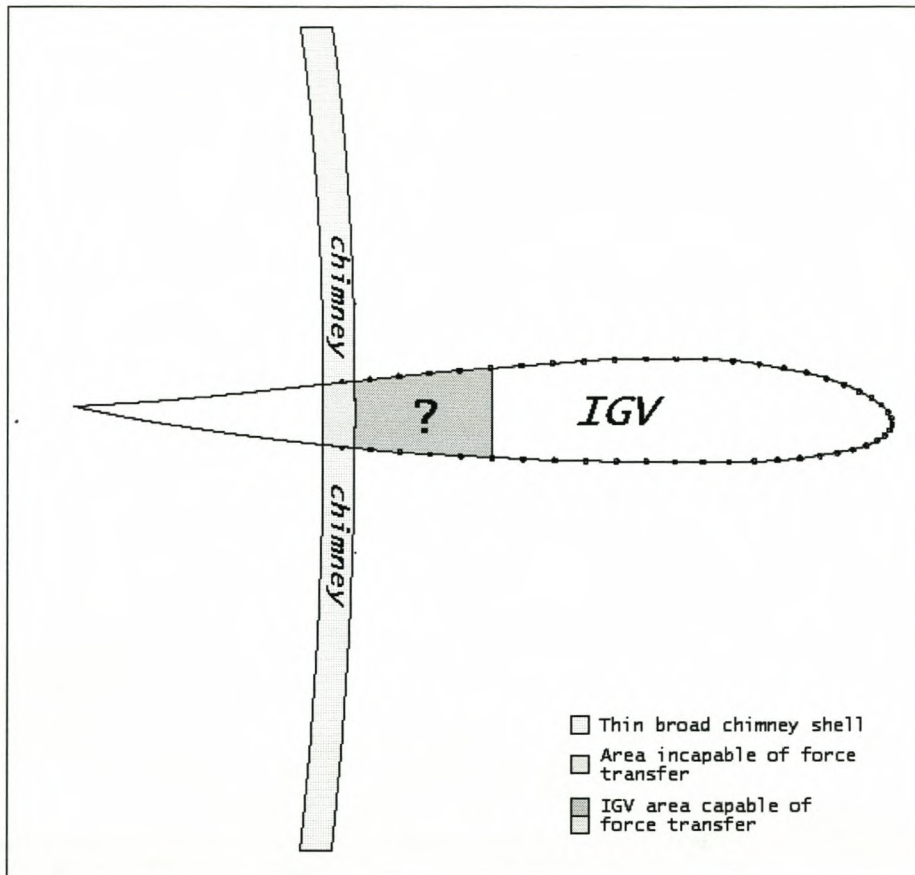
Plan view showing the thin broad area of the chimney shell placed on the IGV section, and the irresolute area of the transfer section.
